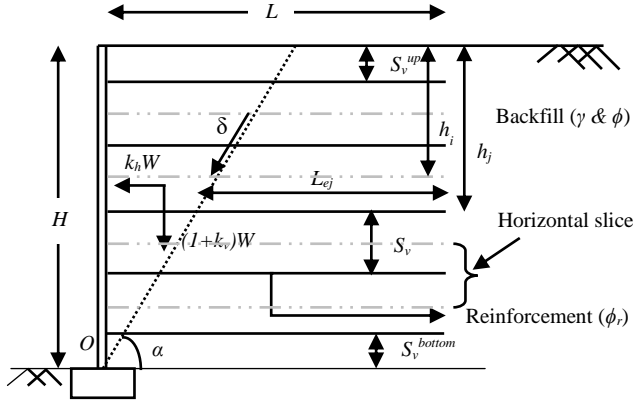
Schematic diagram of a reinforced earth wall with a planar failure surface and horizontal slices (Reddy et al., 2008)
